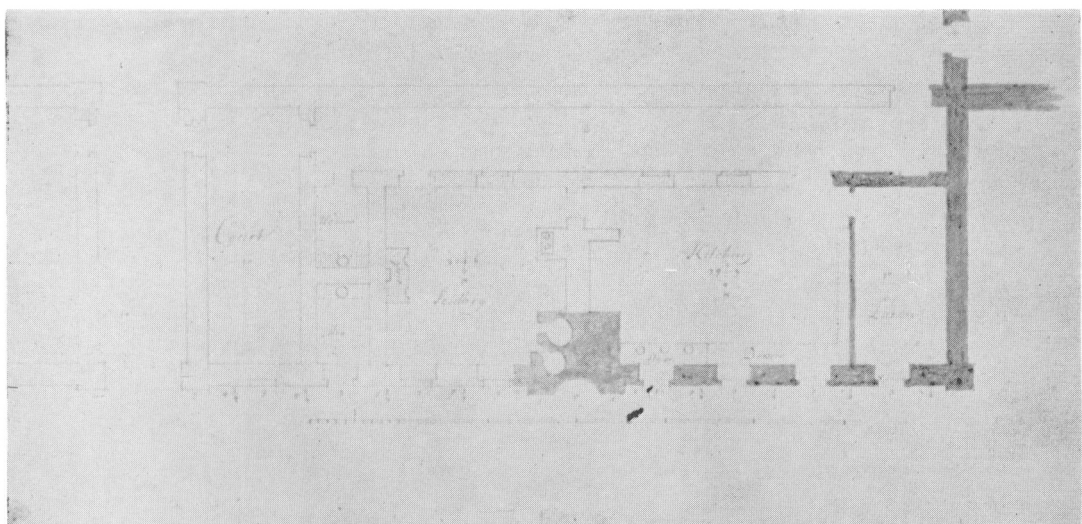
Plan of kitchen wing, Kings Weston [94]
